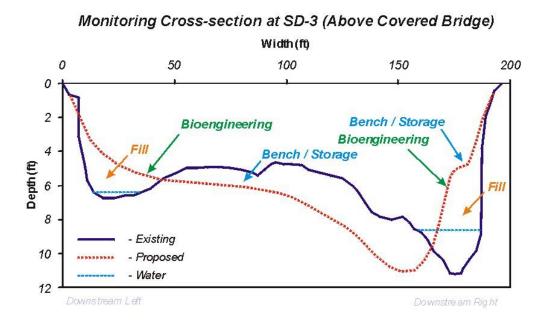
Proposed cross-section at location of existing Monitoring Site for SD-3.
